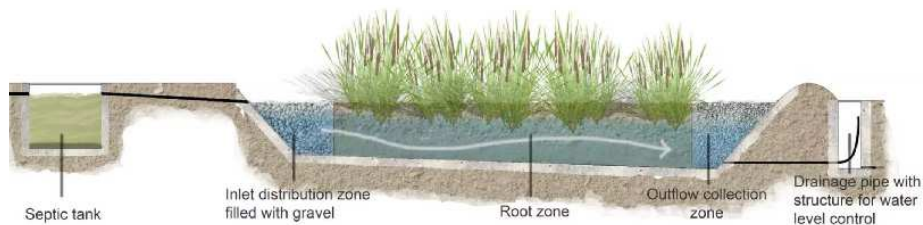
Constructed Wetland - typical cross section with pre-treatment.
